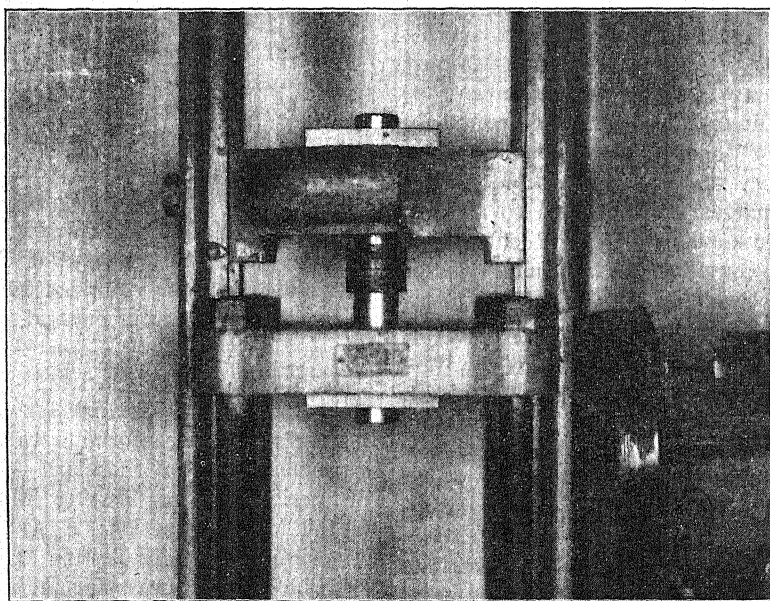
Adhesion Test Specimen Attached in Testing Machine.
